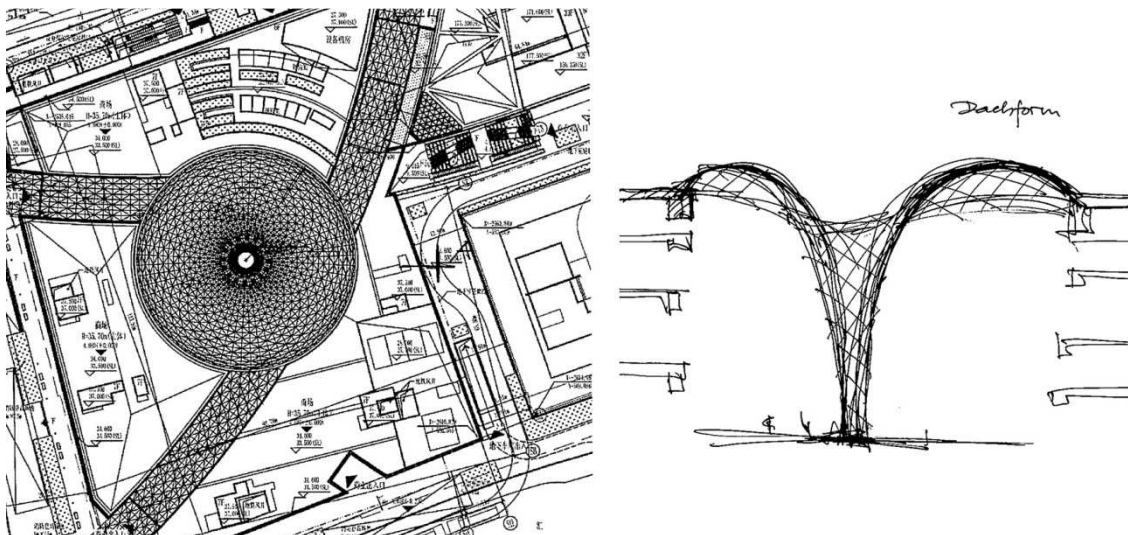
Initial project sketches. Left: The roof level plan. Right: Sketch of the funnel shape in section. Images courtesy of Schlaich Bergemann and Partners
